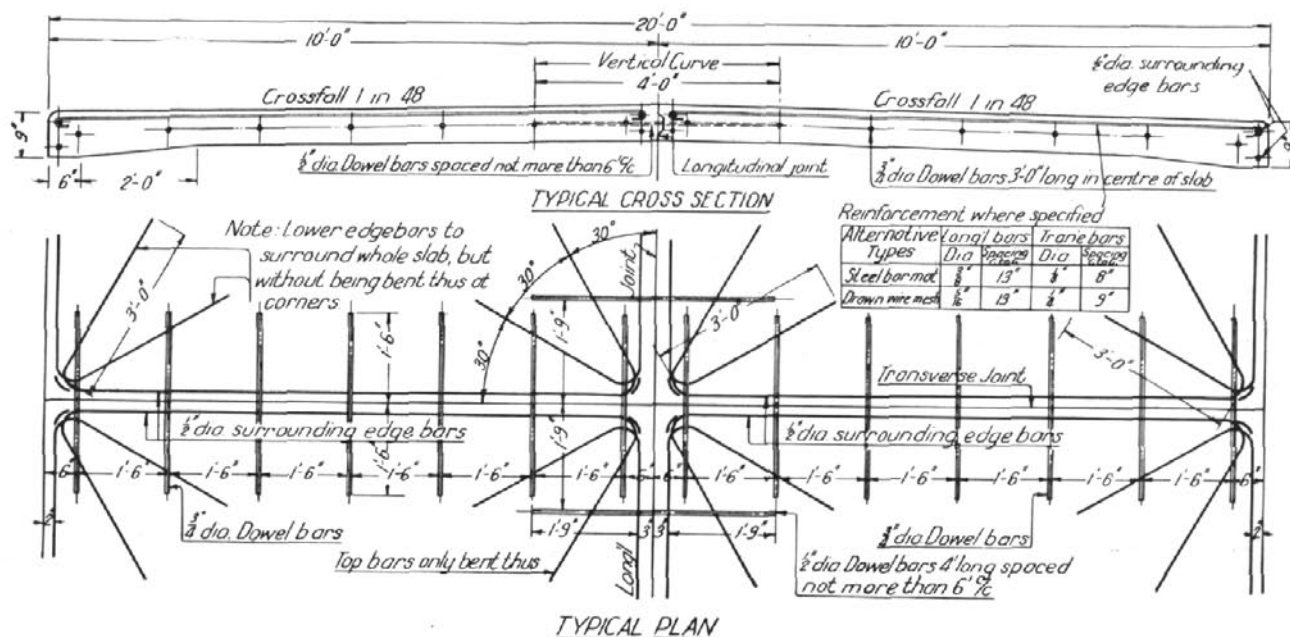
Standard joint and reinforcement details for cement concrete pavement.
